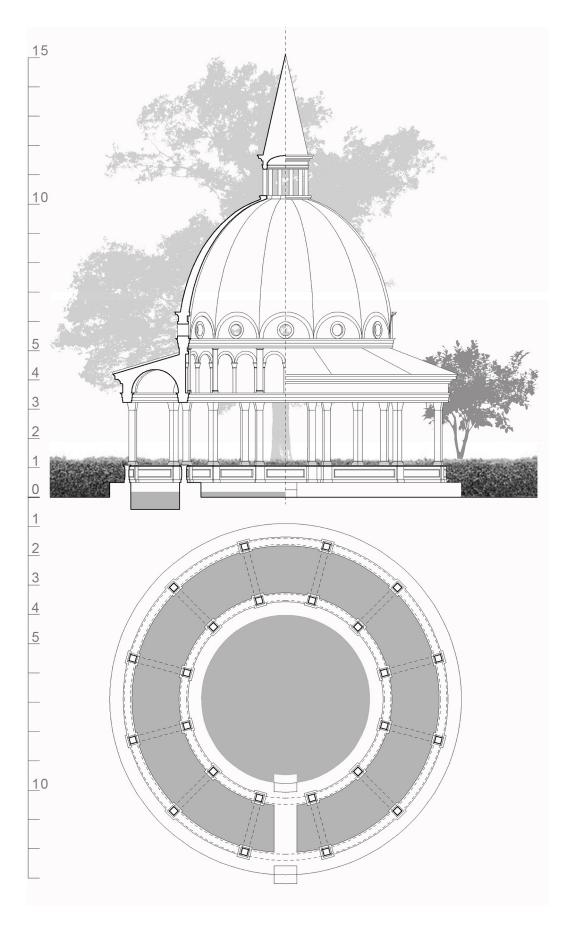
Reconstruction of the pavilion from the section, plan, semi-section and semi-elevation.
